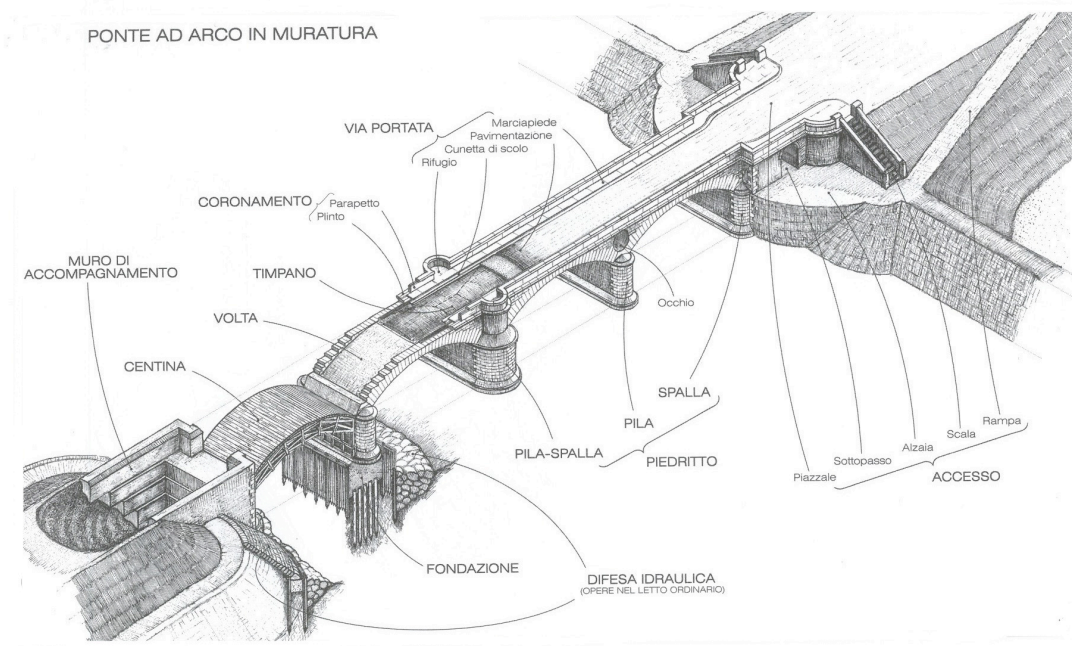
Typical configuration of modern masonry arch bridge, taken from [Torre, 2003].
